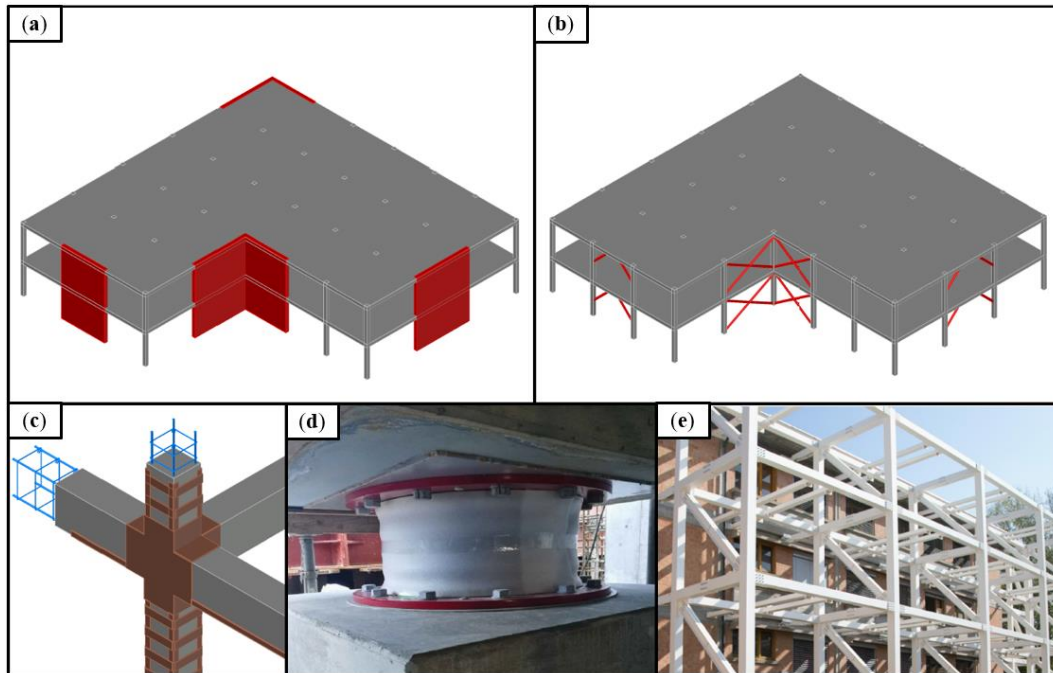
Most common retrofitting strategies for improving the overall structural behaviour: (a) Reinforced concrete walls; (b) steel bracing; (c) strengthening and confinement of structural nodes (picture shows node confinement in the case of steel caging and plate for retrofitting columns and beams); (d) base isolation and damping systems; (e) Exoskeleton structures (“Corazza” Primary school in Parma [126]);
